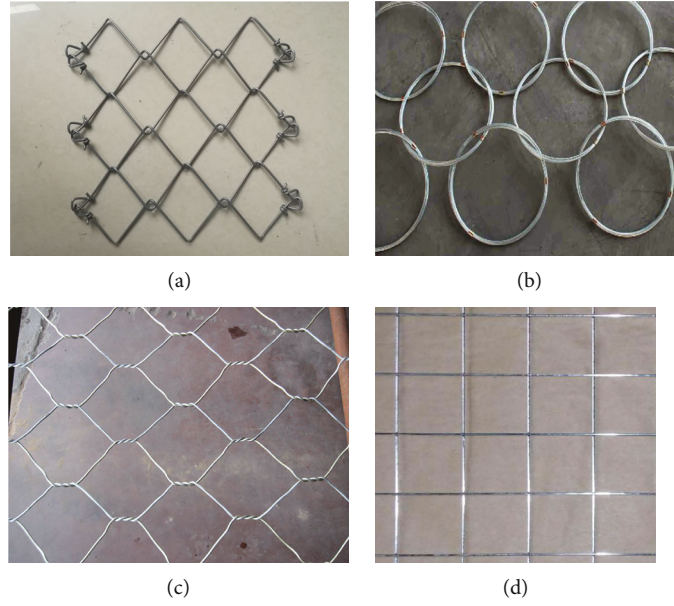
Wire nets woven by the steel wires: (a) chink-link wire nets; (b) ring nets; (c) double-twisted wire nets; (d) welded-wire nets.
